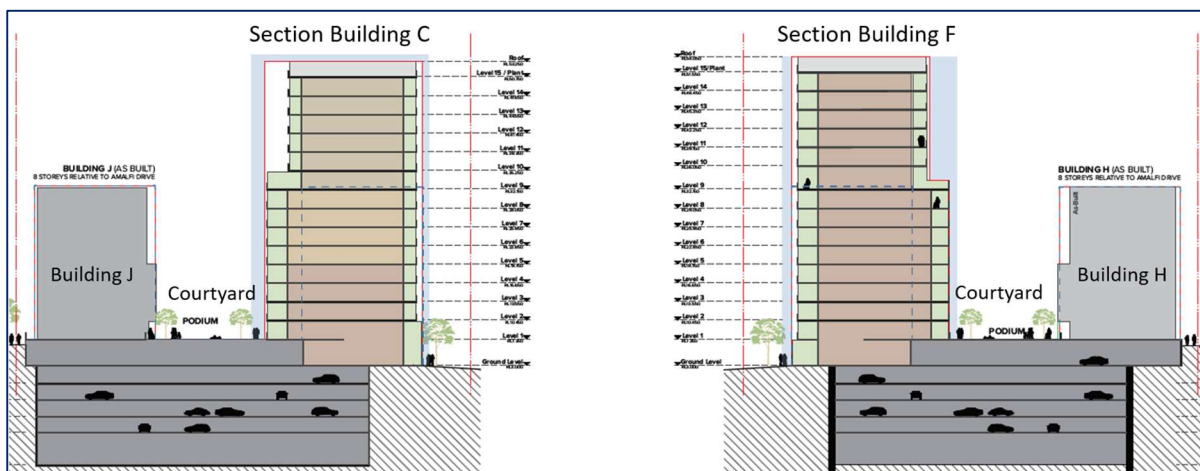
| Proposed sections of building envelopes C and F (Source: FRtS Modified Concept Plan Drawings)
